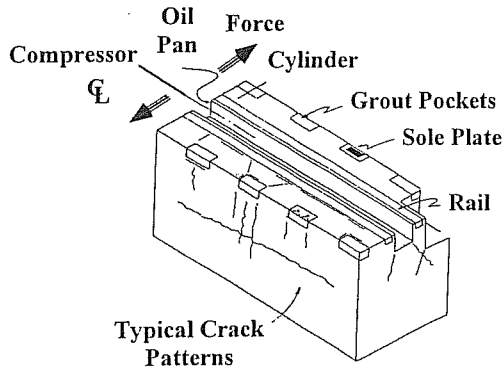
Foundation Block Isometric View – Compressor Area Showing Grout Pocket, Soleplates and Observed Areas of Cracking
